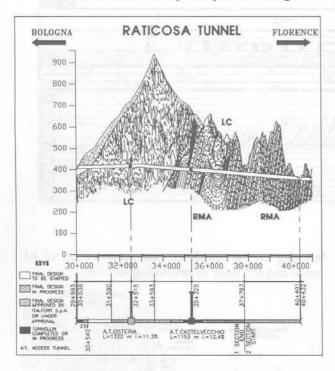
"Raticosa" tunnel: longitudinal geological section.
